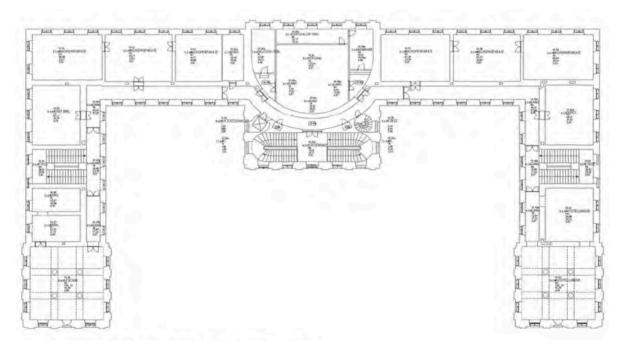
Josephinum or surgical academy, inventory plan of the first floor
